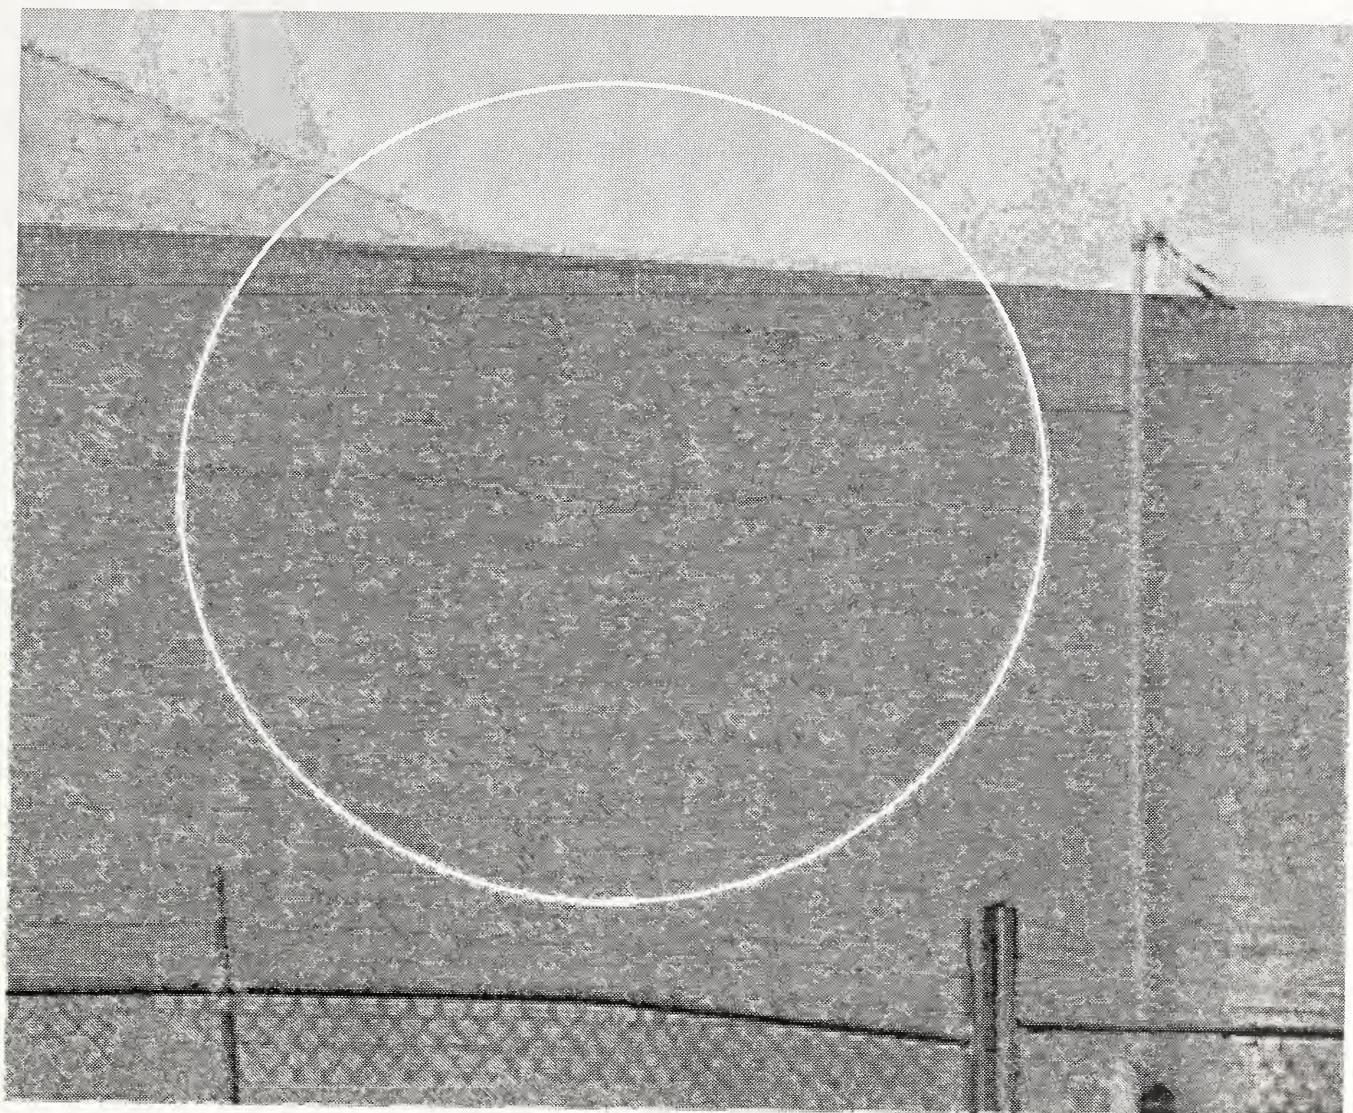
Photograph of rear wall showing developing crack in the wall.
